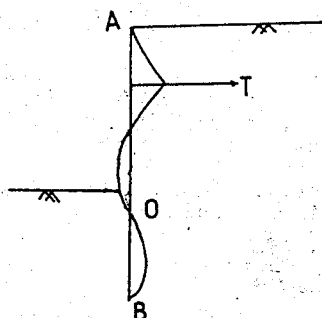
Typical BM diagram for Anchored sheet pile for Fixed earth support condition
